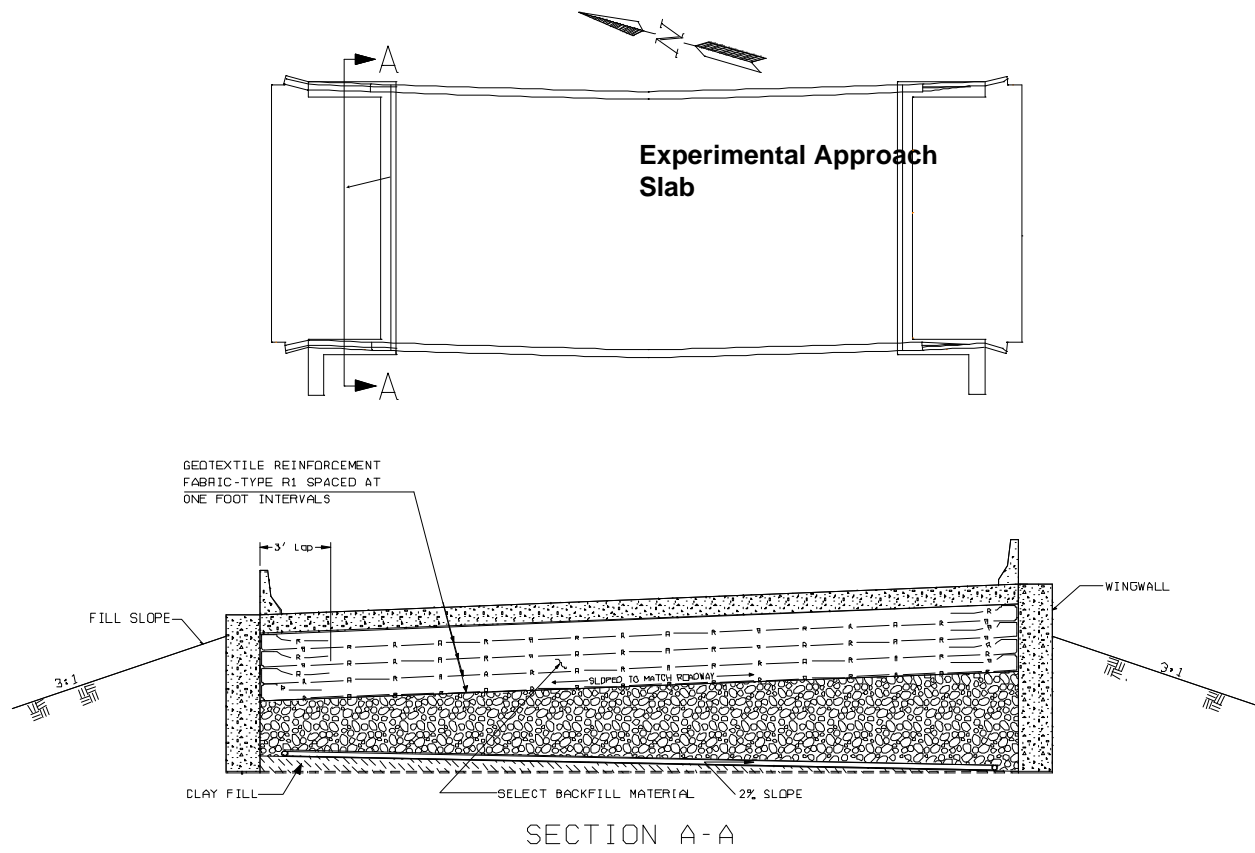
Detail for Fabric Reinforced Backfill under the Approach Slab
